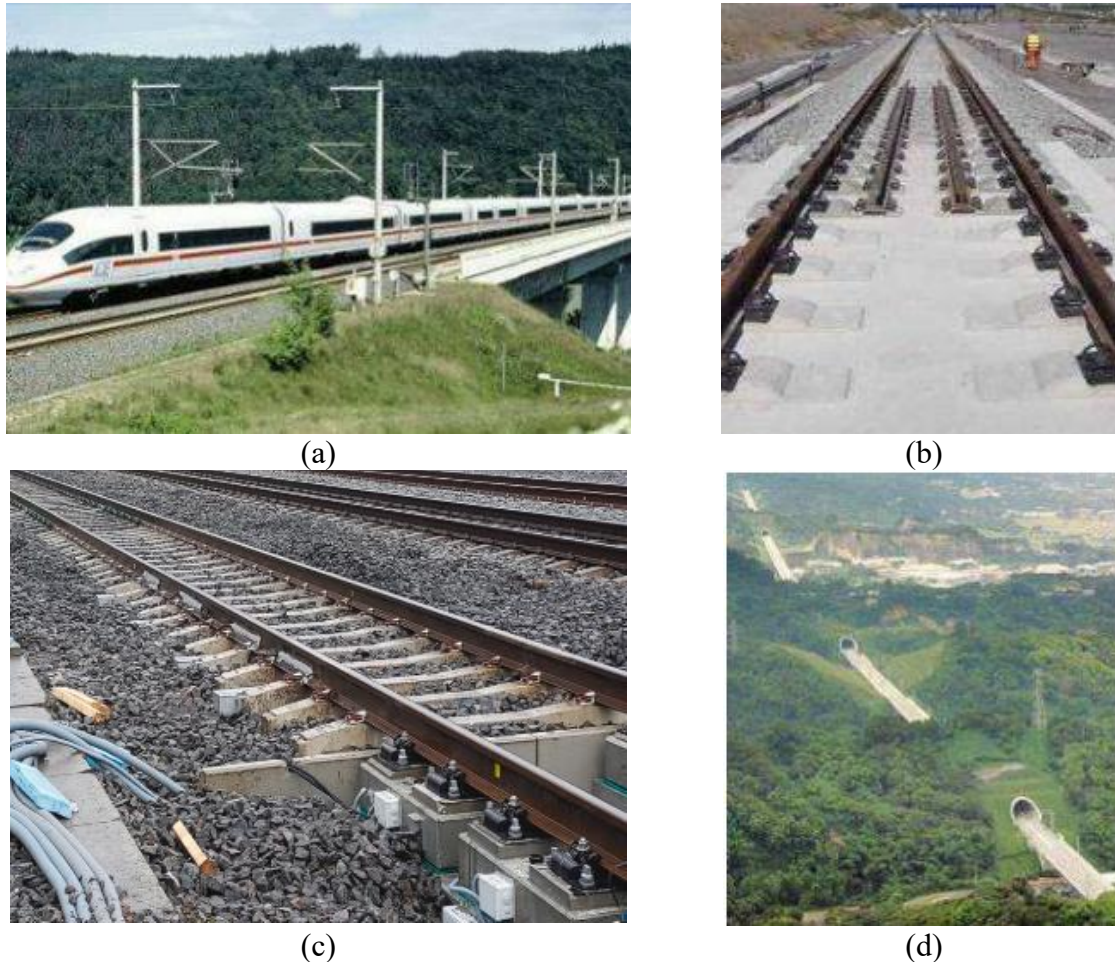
Examples of transition zones: a) between ballasted track on embankment and bridge [32], b) between ballasted track and slab track [32], c) between ballasted track and 3MB slab track at Gransjö, north of Boden, Sweden [9], d) successive transitions between track on bridge and track in tunnel [32].
